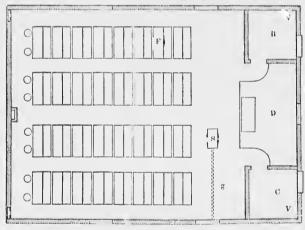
Ground Plan, adapted, with modifications, to Figs. 79, 81, 84 and 86.
